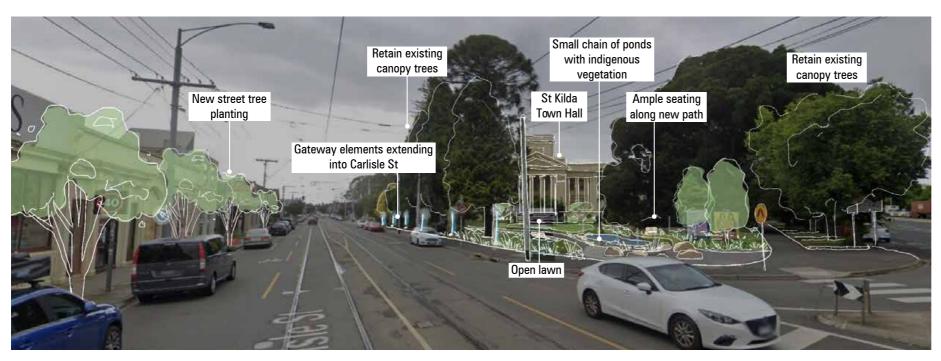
Perspective sketch illustrating western gateway to Carlisle Street and Town Hall Reserve, and new tree planting in footpath cutouts at the western end of Carlisle Street.
